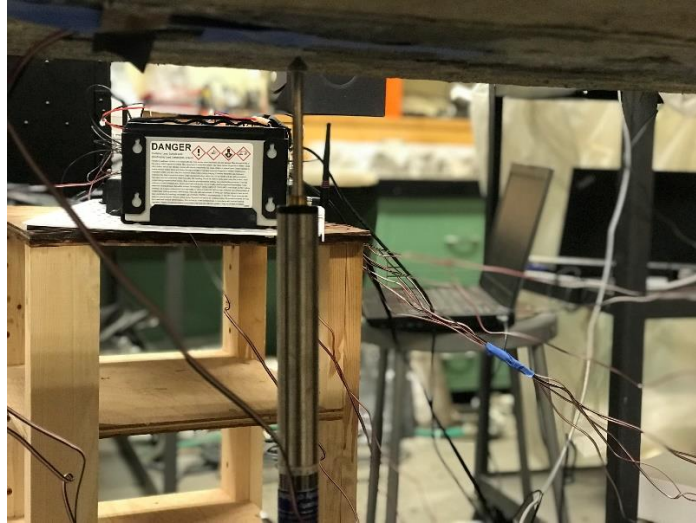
LVDT for recording midspan deflection (Underneath the beam)
